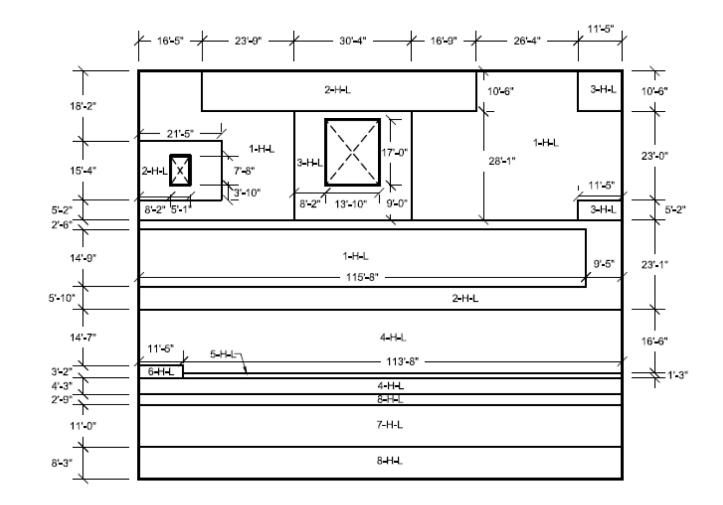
H.3-19 East Wall Looking West Vertical Reinforcement Zones Near Side Face
